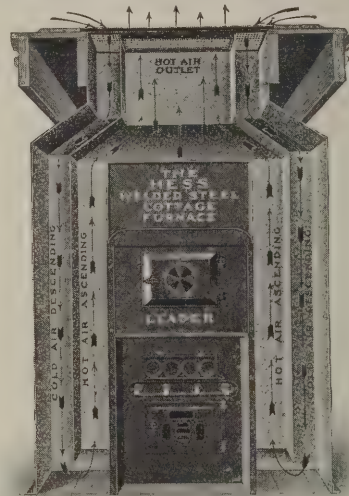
Sectional View of the Hess Welded Steel Cottage Furnace Showing Course of Air Currents
